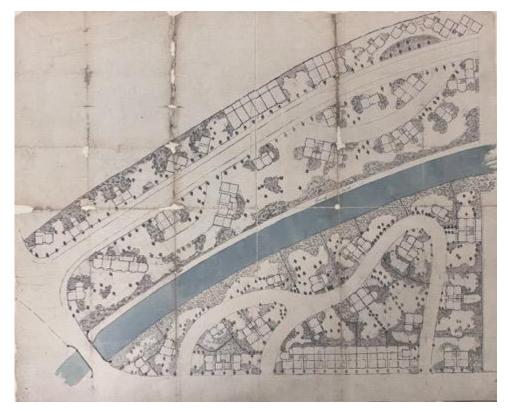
Regent's Park: block plan of Park Village West, showing sites of houses and the Regent's canal. By John Nash. 1812 or 1823 (National Archive Ref MPE 1/1159).
